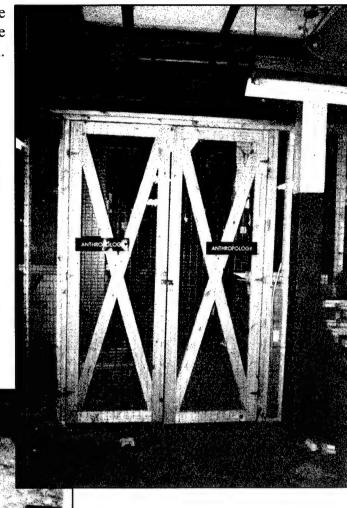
Opening in the west wall that was originally covered with a retractable metal shade.
